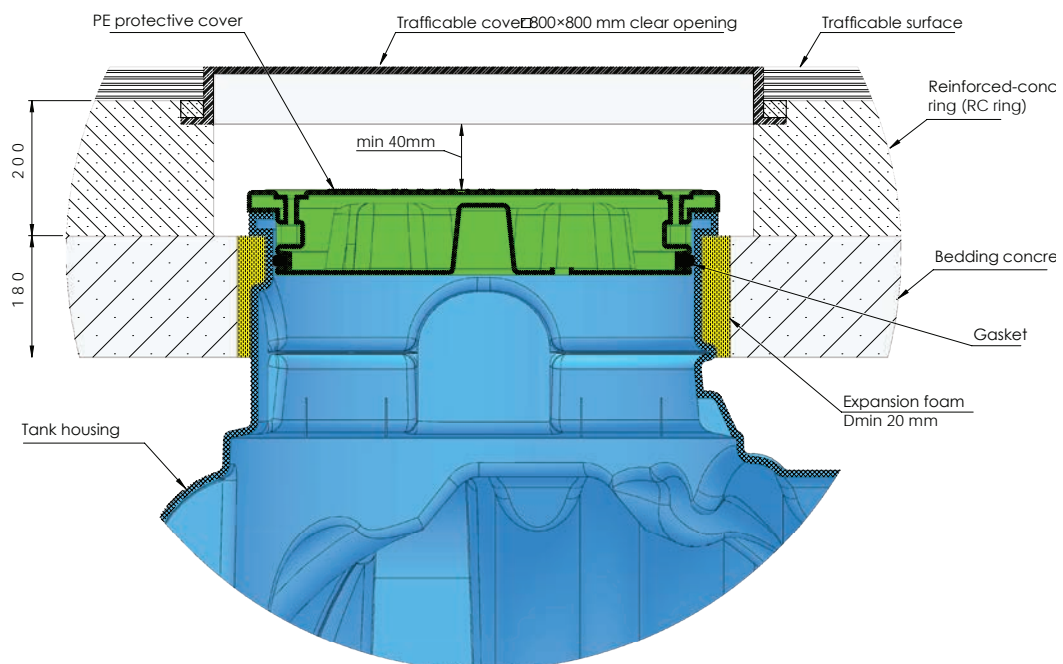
Detail of installation of the reinforced-concrete (RC) relieving ring
